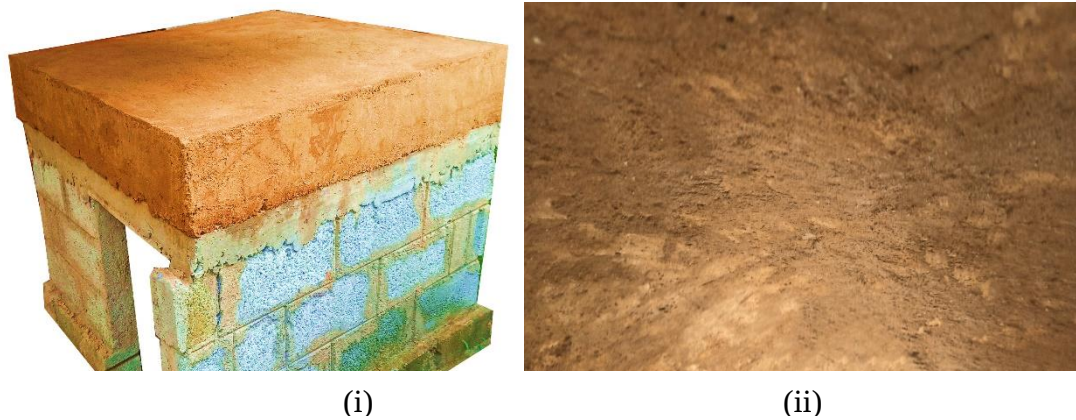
(i) Completed earthen thin shell slab system & (ii) underside of the slab after erecting the formwork
